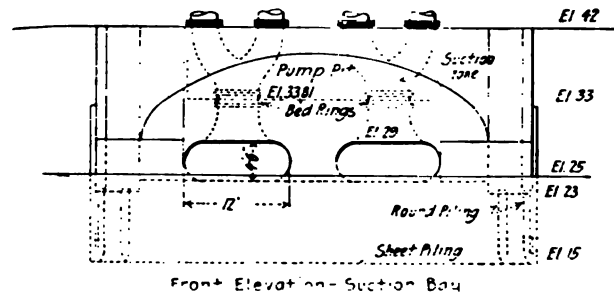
FOUNDATION DETAILS OF THE PUMPING PLANT IN FIG. 44
